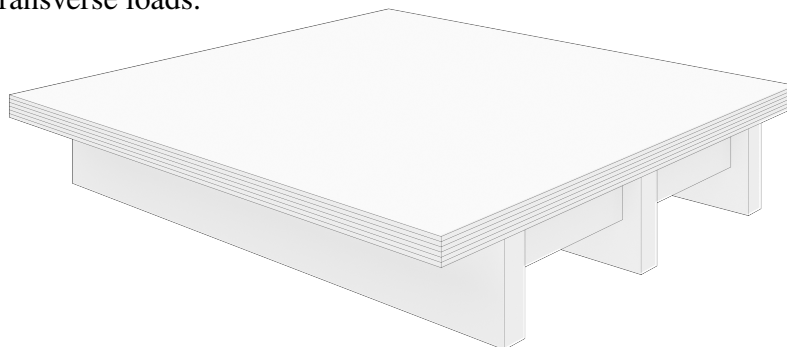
Illustration of a beam bridge with CLT-slab.
